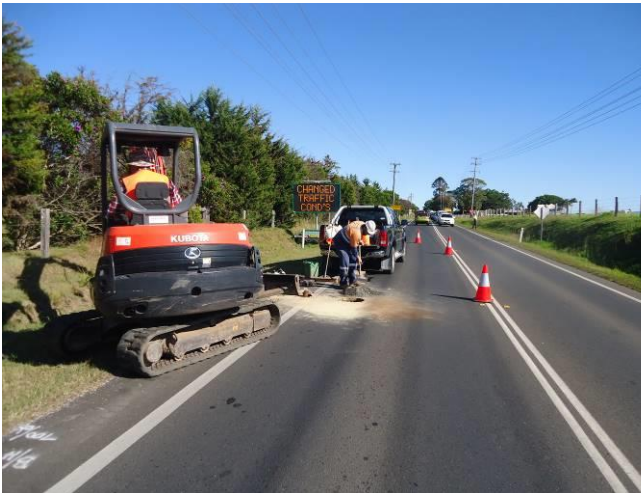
West facing in the location of BH 11 in the OWP of Ewingsdale Road.
